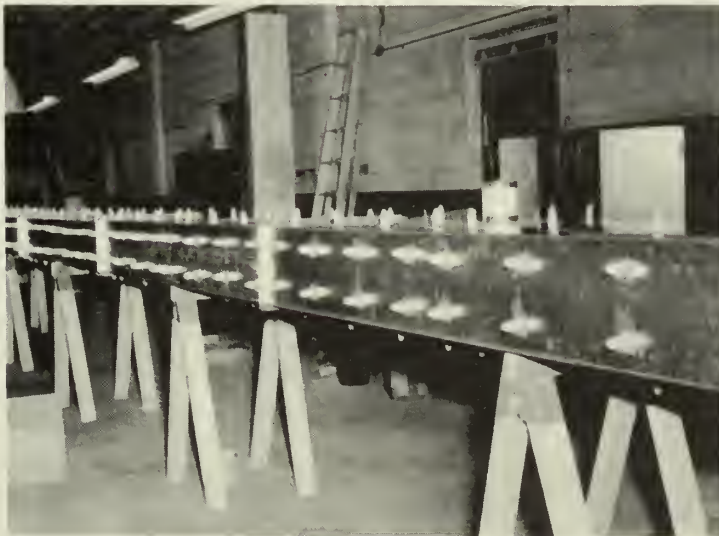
" X 24" Ducting with Clips for Mounting P.F. Board
